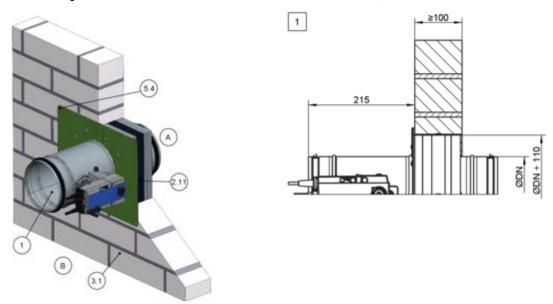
Dry mortarless installation into a solid wall, with installation kit TQ2
